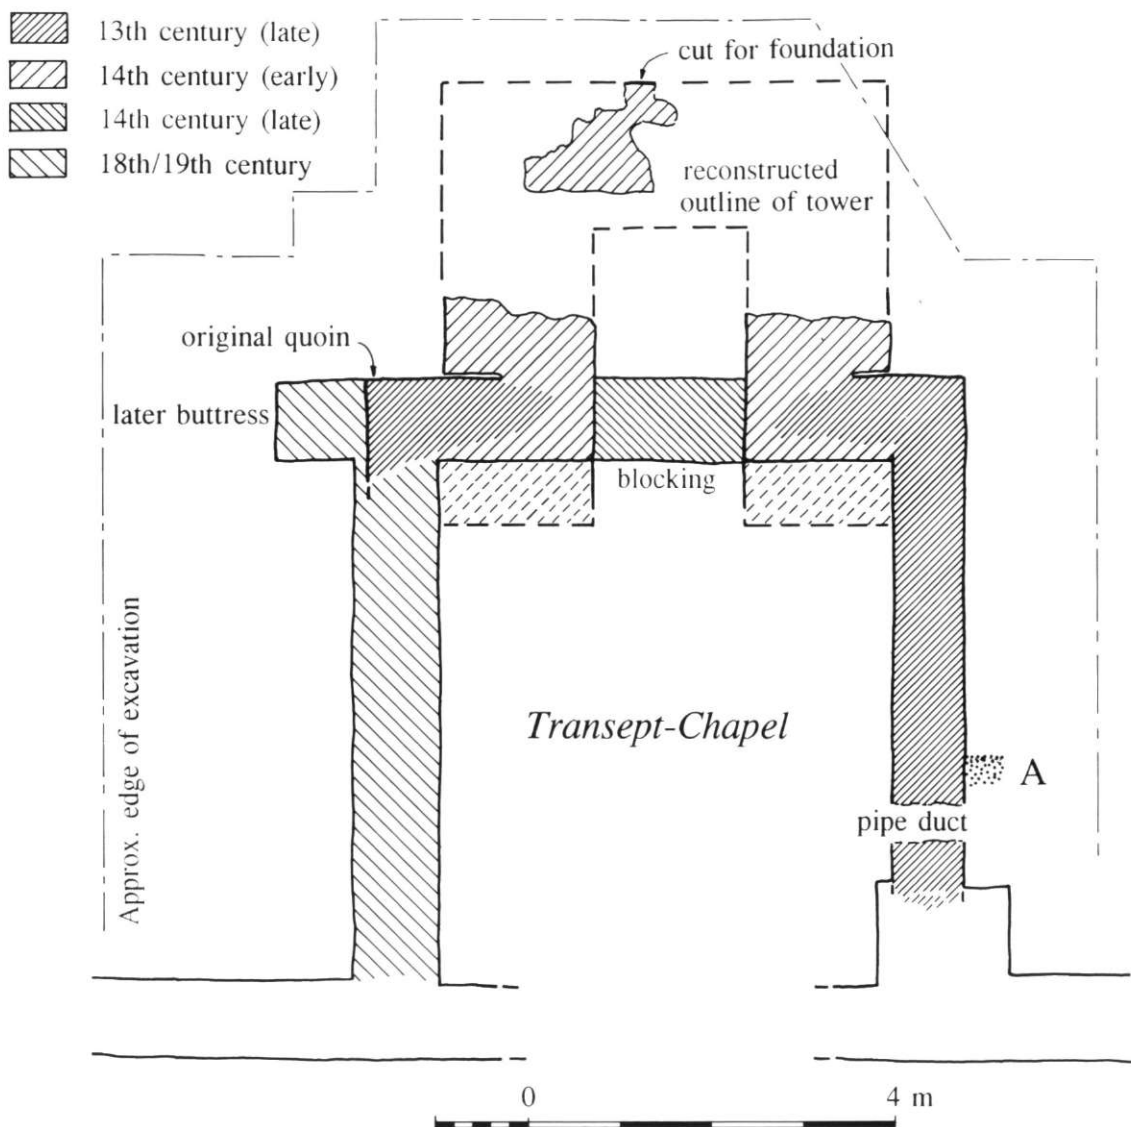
Foundation plan of the north transept and former north tower, showing the four periods of construction. The small patch of foundation masonry at 'A' is undated.
